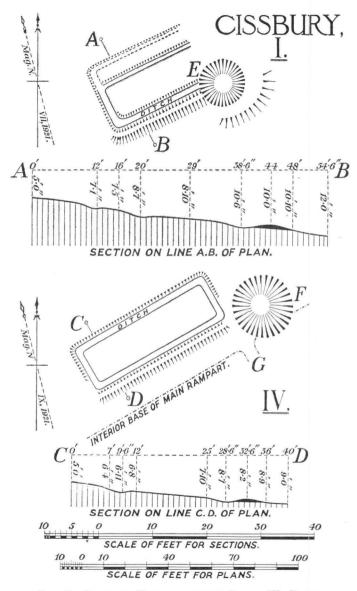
Interior Entrenchments I and IV, Plans and Sections.
